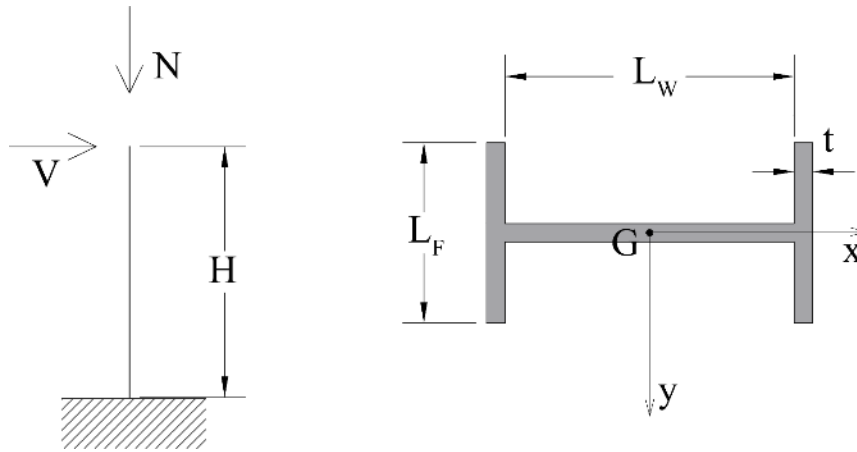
Cantilever beam subjected to combined vertical and horizontal loads and its I-shaped cross section
